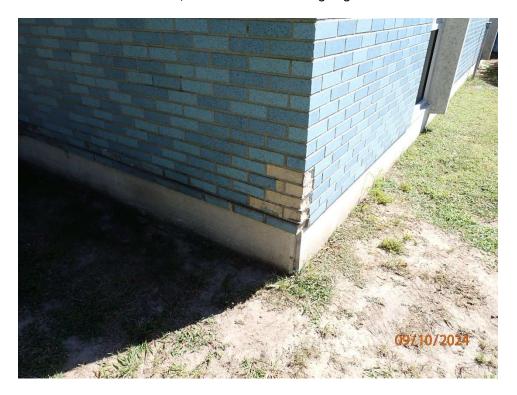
North Toll Plaza, Administration Building brick with minor deterioration at isolated locations. Overall, in good condition.
